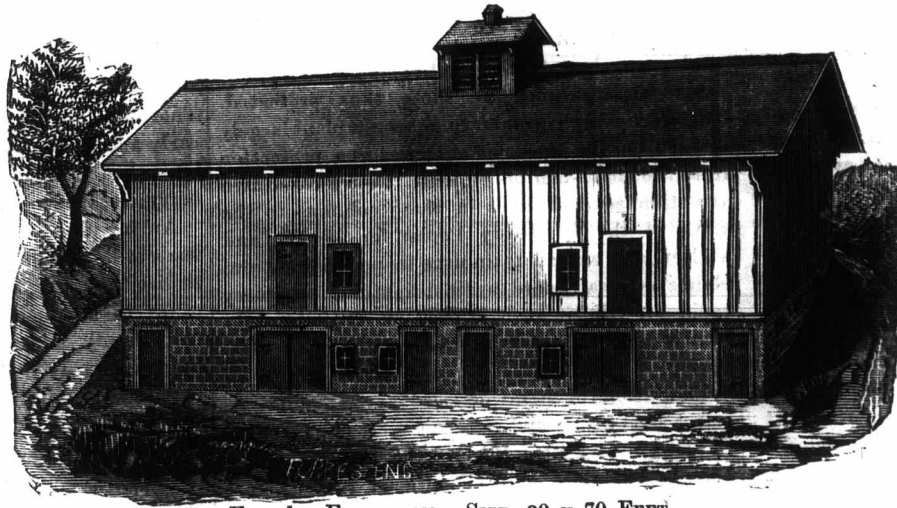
ELEVATION. SIZE, 30 x 70 FEET.
